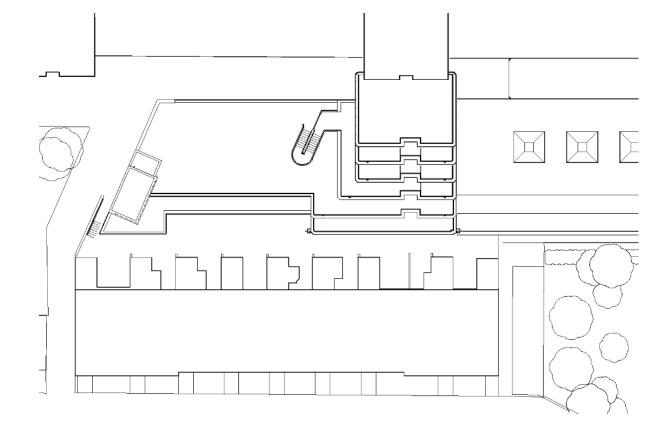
Roof plan as proposed with stepped profile to spur forming terraces, reinstated cantilever and amended stair.
